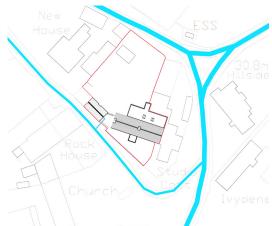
Site Block Plan Showing Proposed Access Routes.
